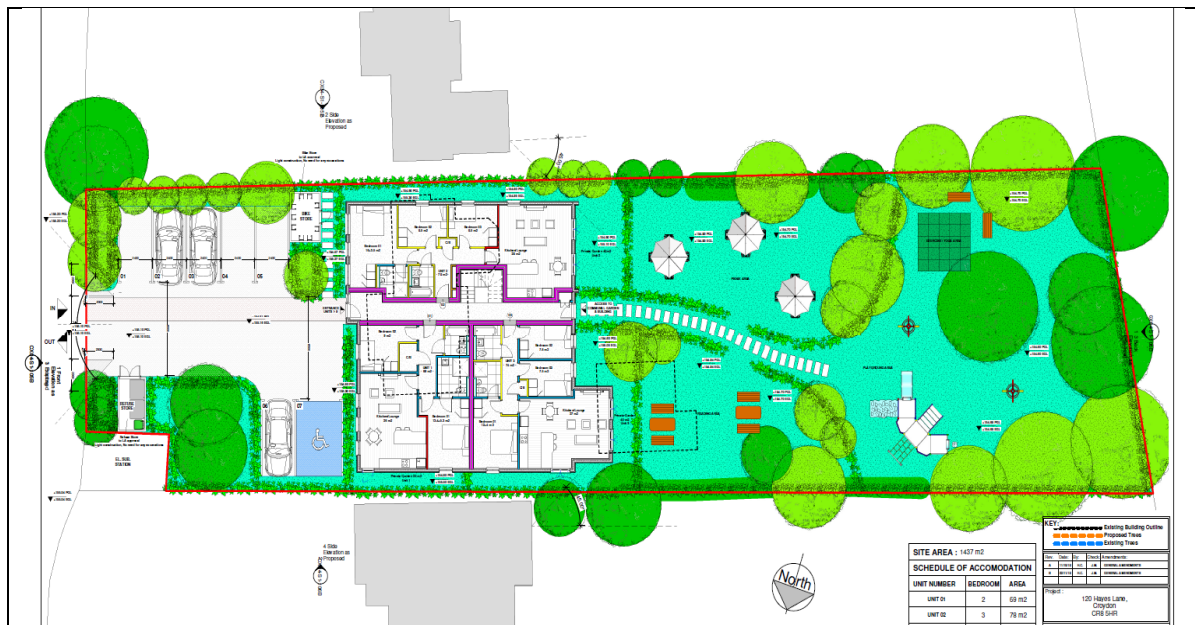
Ground floor plan proposed site showing proposal in relation to neighbouring properties
